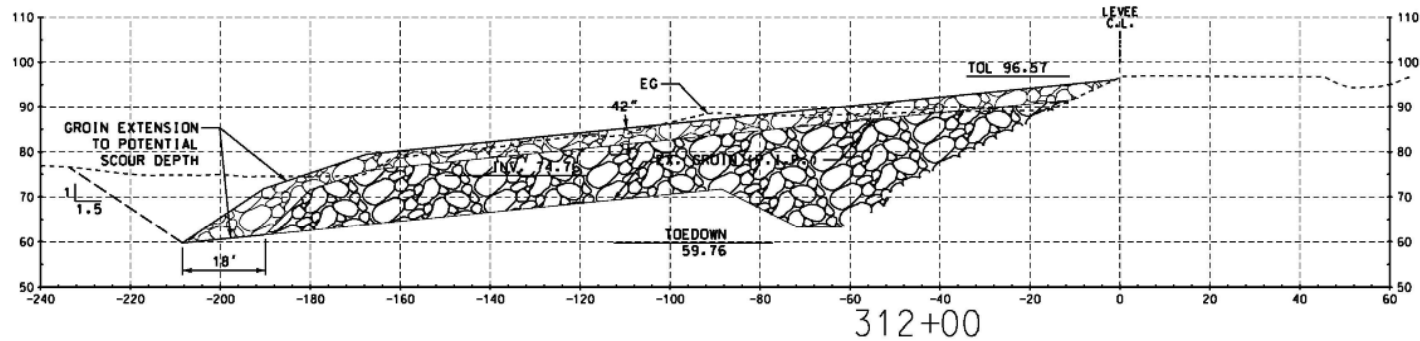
Typical Cross Section of Measure 12, Failure Reach 1
